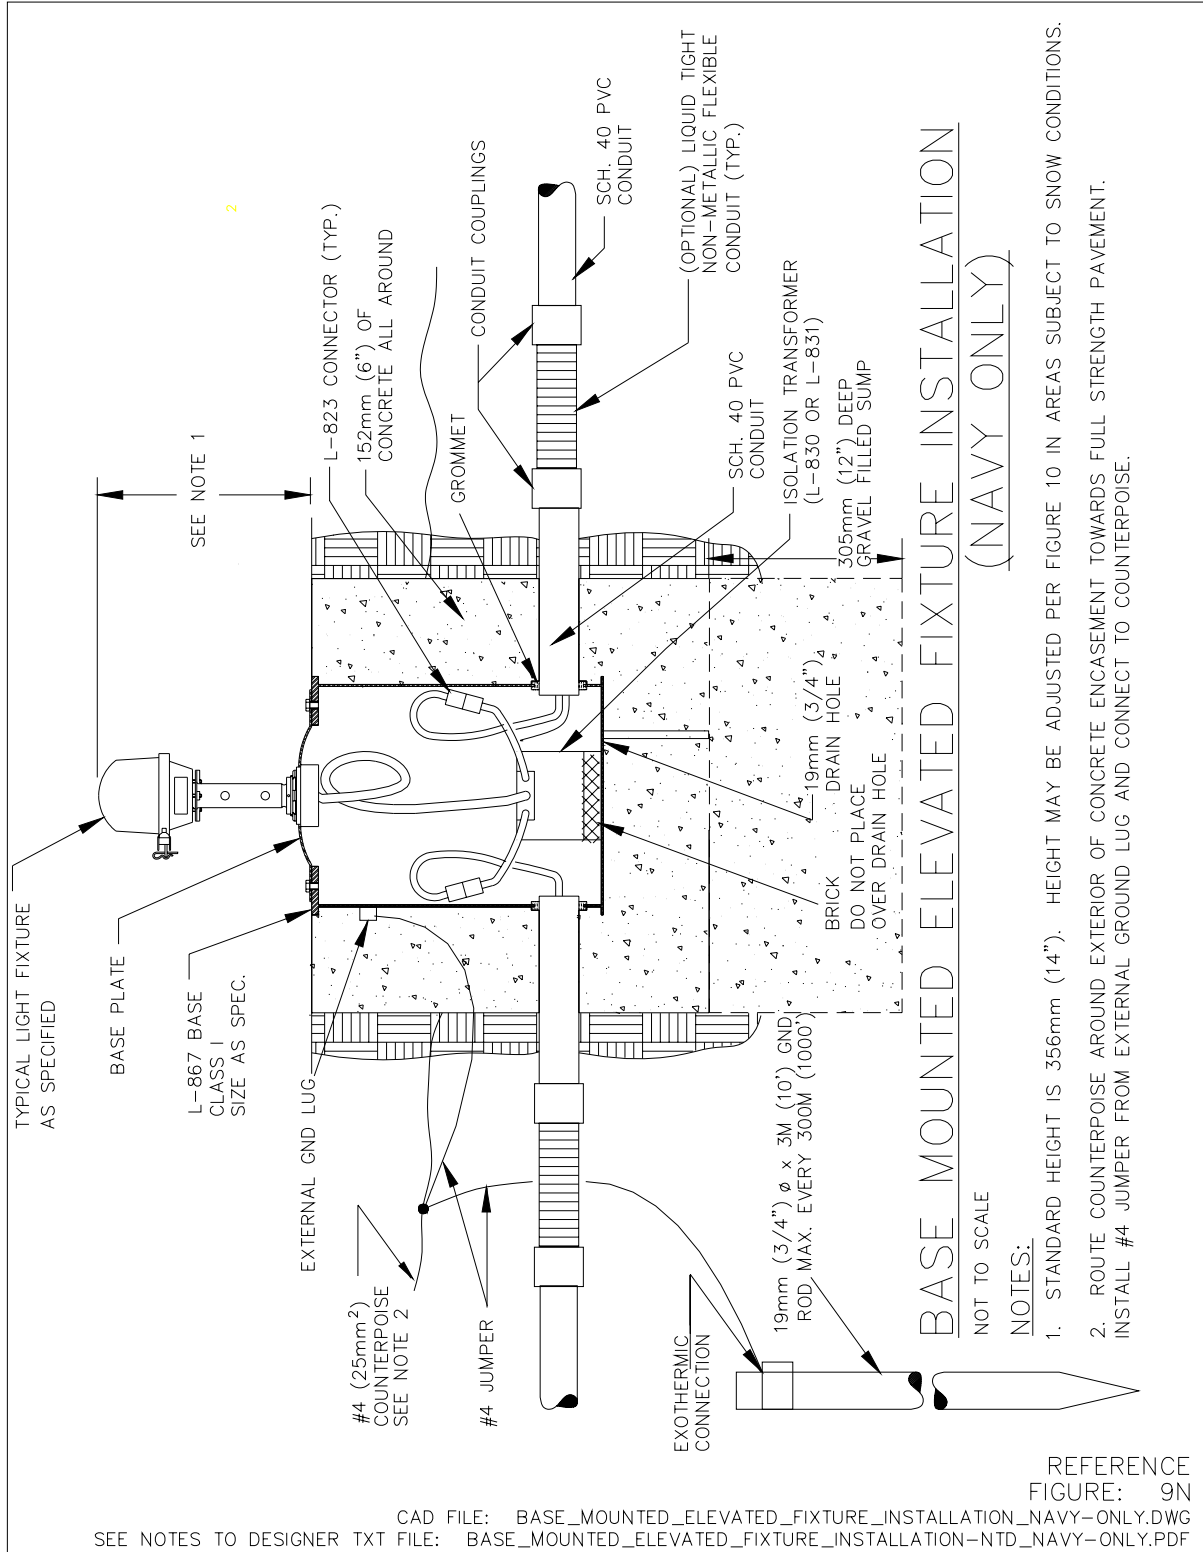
N. Base Mounted Elevated Fixture Installation (Navy Only)
